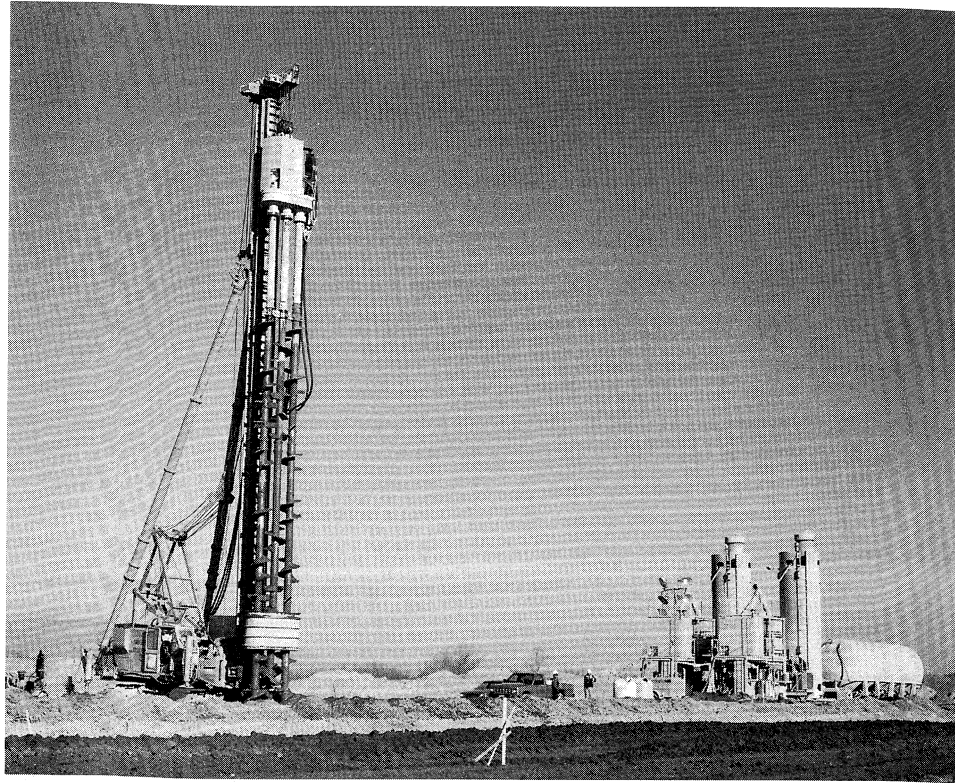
Triple auger soil mixing rig improving liquefiable soils at Jackson Lake Dam in Wyoming. Grout batch plant is at right (photo courtesy of SMW Seiko, Inc.)
